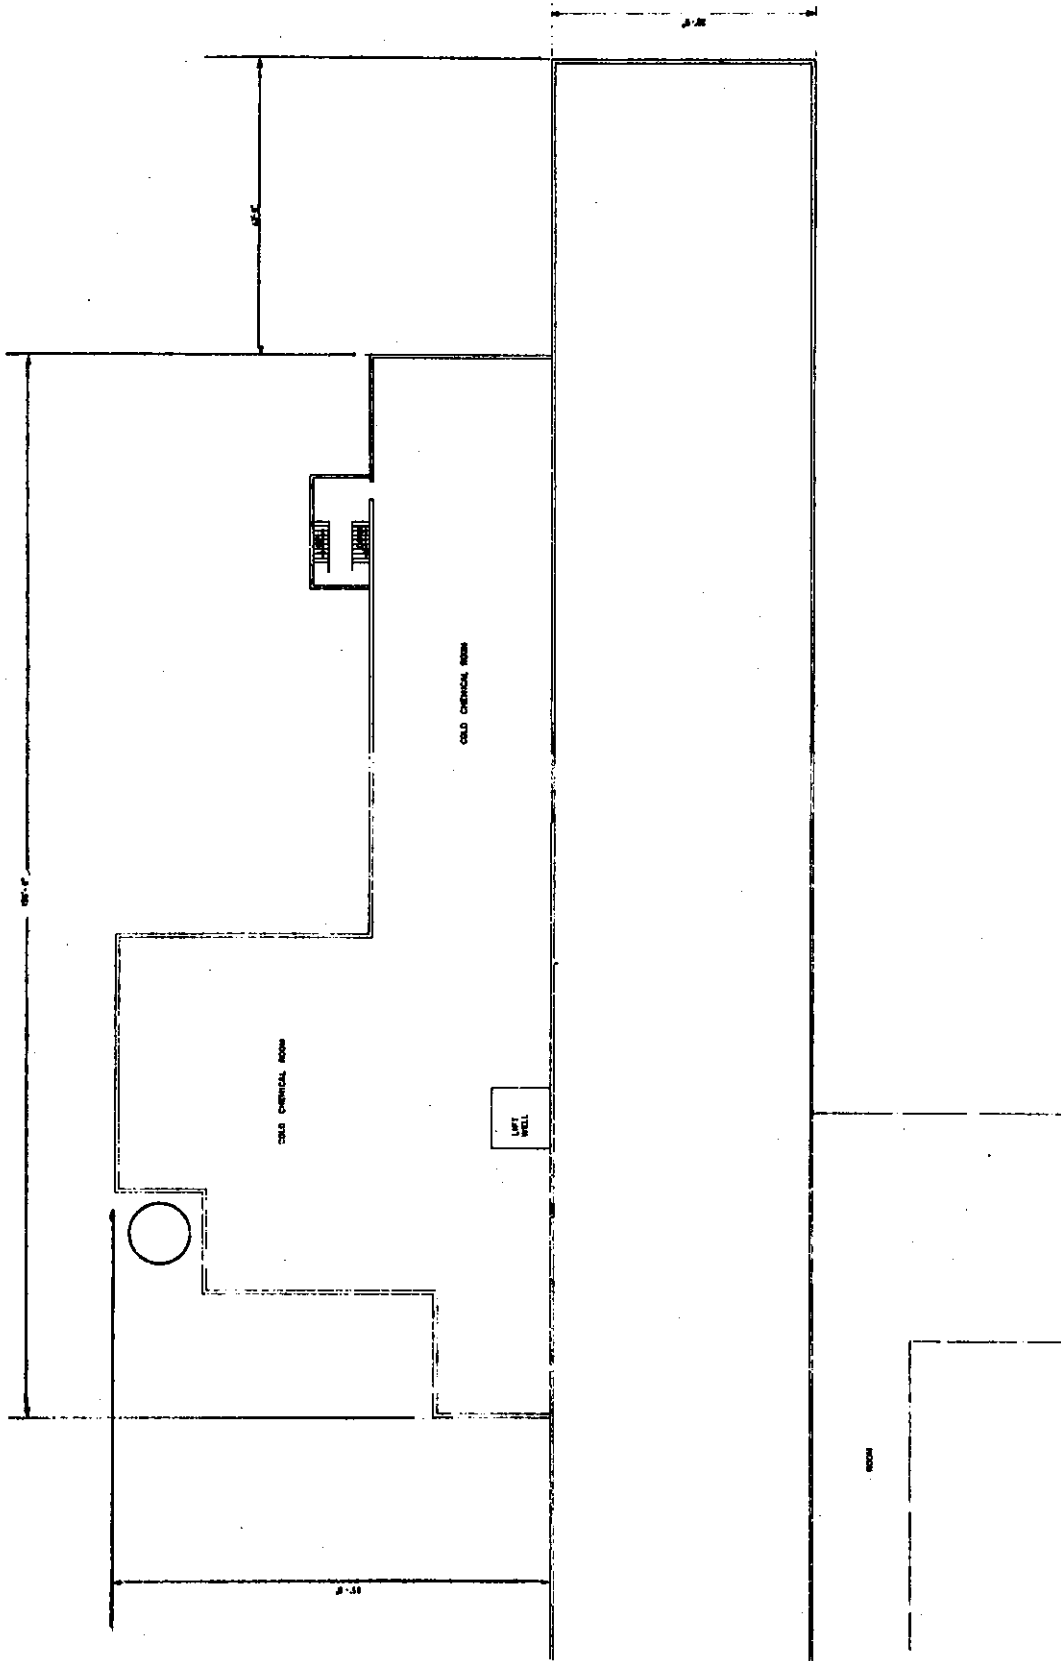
BUILDING DESIGN - 50.5 ft TO 65 ft
